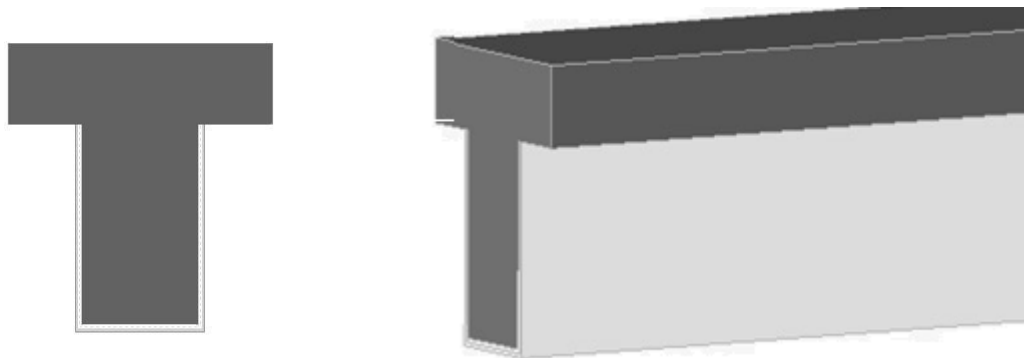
U-jacketed GFRP wrapped on the Beam 4
